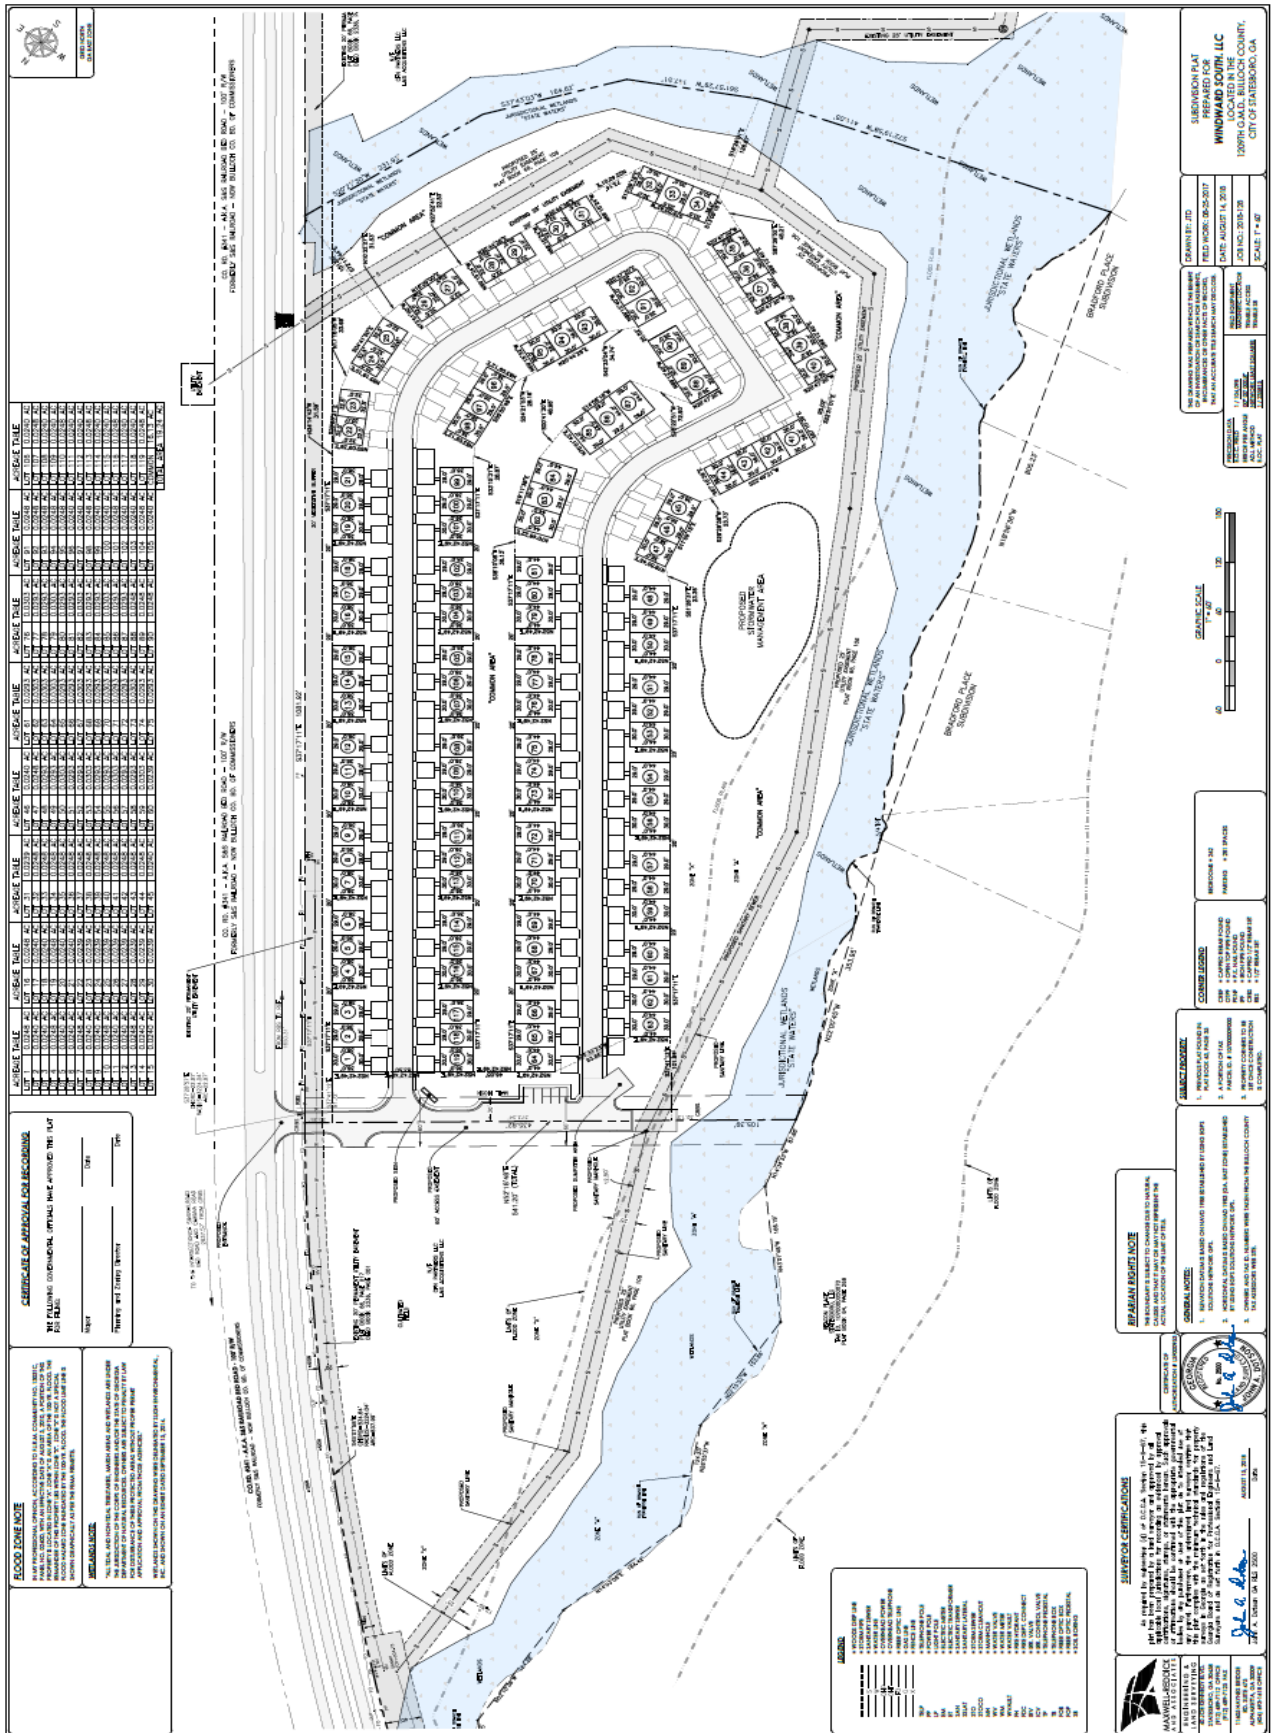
EXHIBIT G: REVISED SITE PLAN W/ FEE SIMPLE LAYOUT (DATED: AUGUST 15, 2018)
